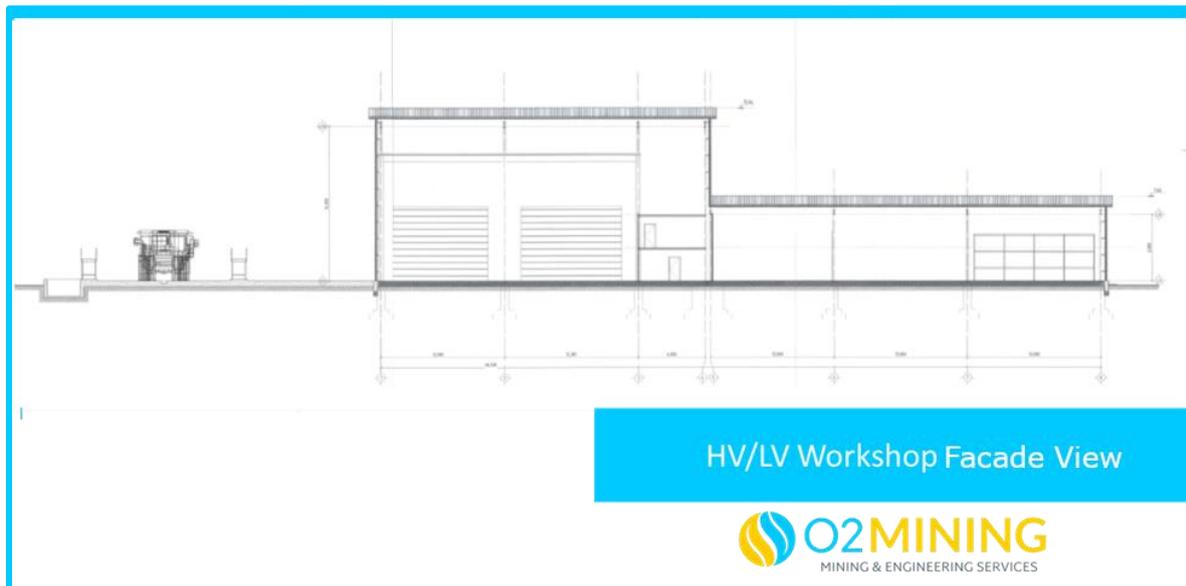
HV/LV Workshop Facade View (Source O2 2023)
